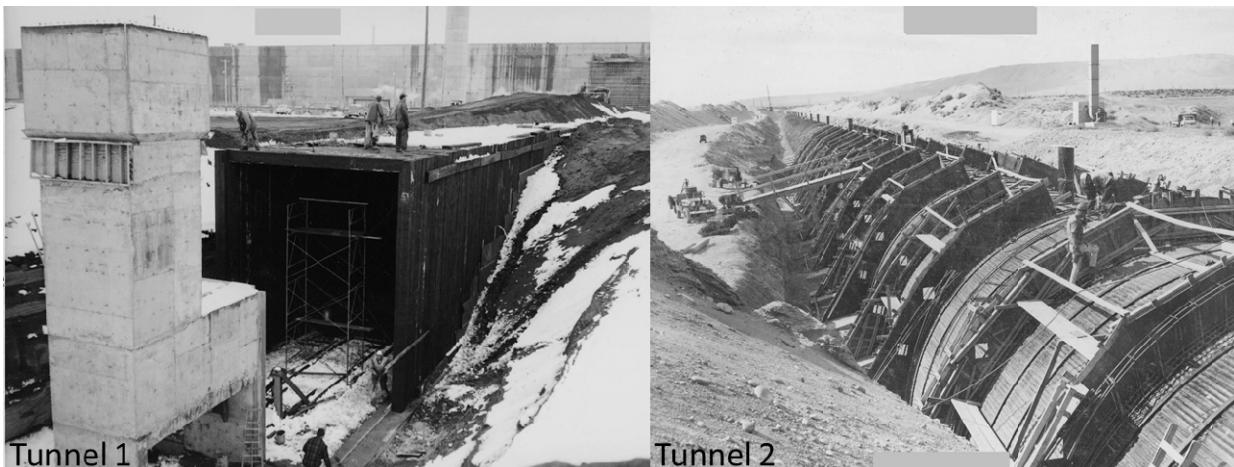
Tunnel 1 and Tunnel 2 during Construction
